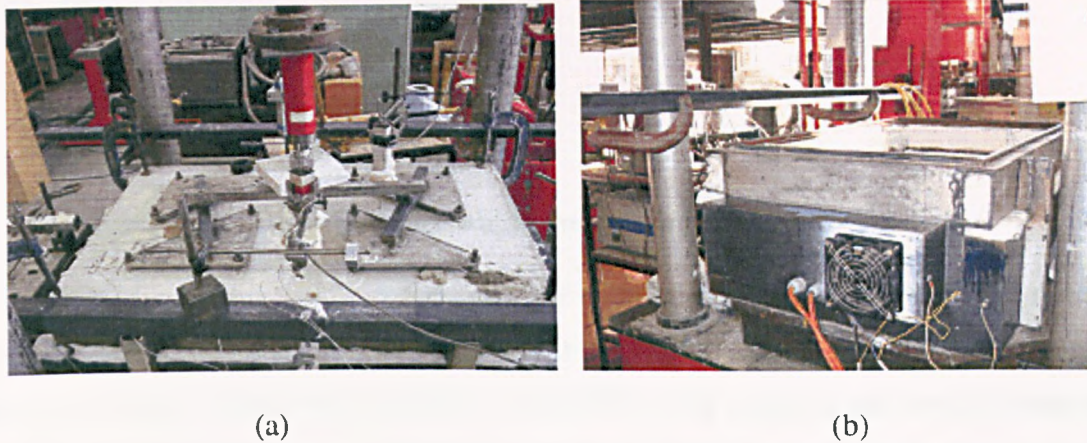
2: Typical arrangement of test set-up and supporting frame, (a) Loading fame and (b) View of gas furnace.
